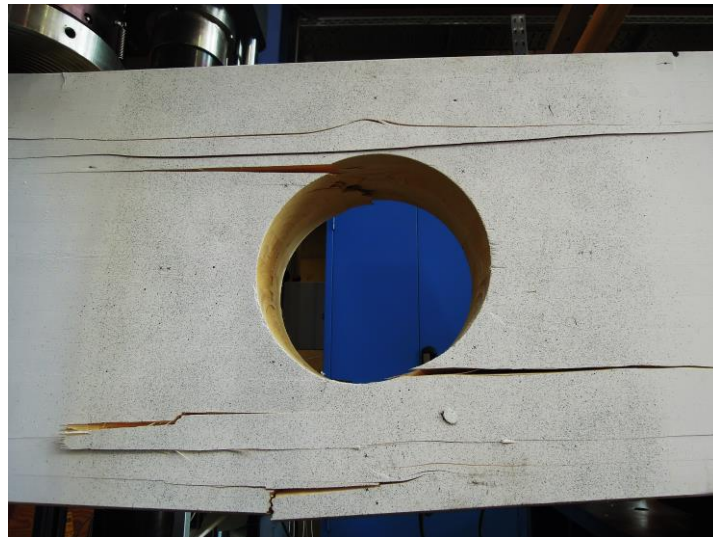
Bending failure in the net cross section and cracks around the opening of test specimen G01
